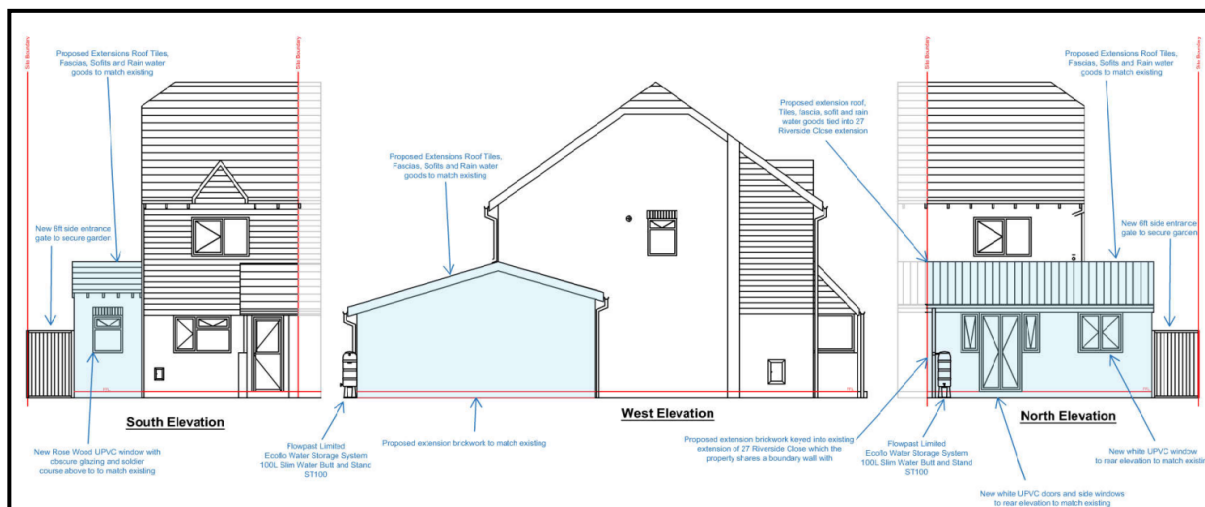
Proposed Elevations with pale blue detail being the proposed extension
